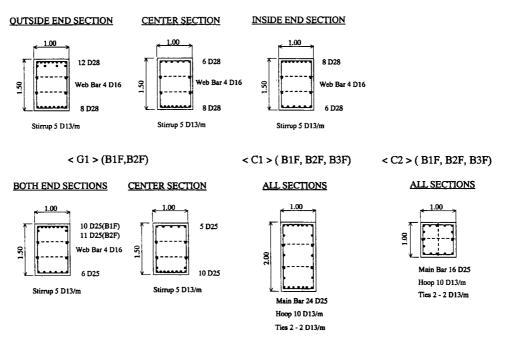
Arrangement of Reinforcement for Main Beam/Column
